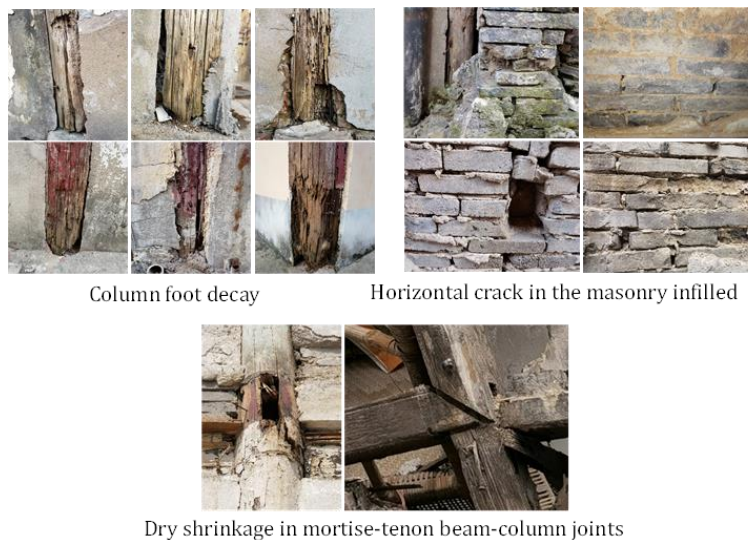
Different kinds of damage of masonry-timber mixed structures
